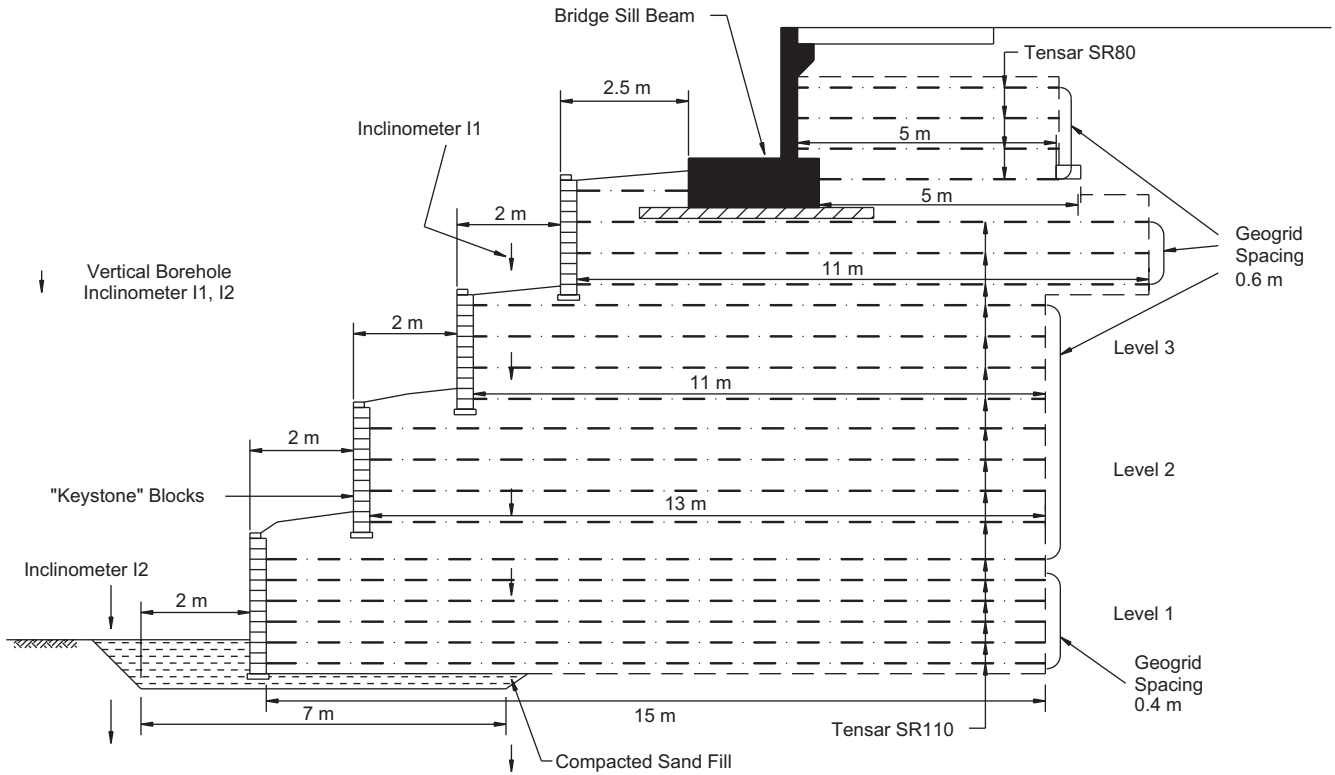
Cross-section of the New South Wales GRS bridge abutments, Australia (Won et al., 1996).
